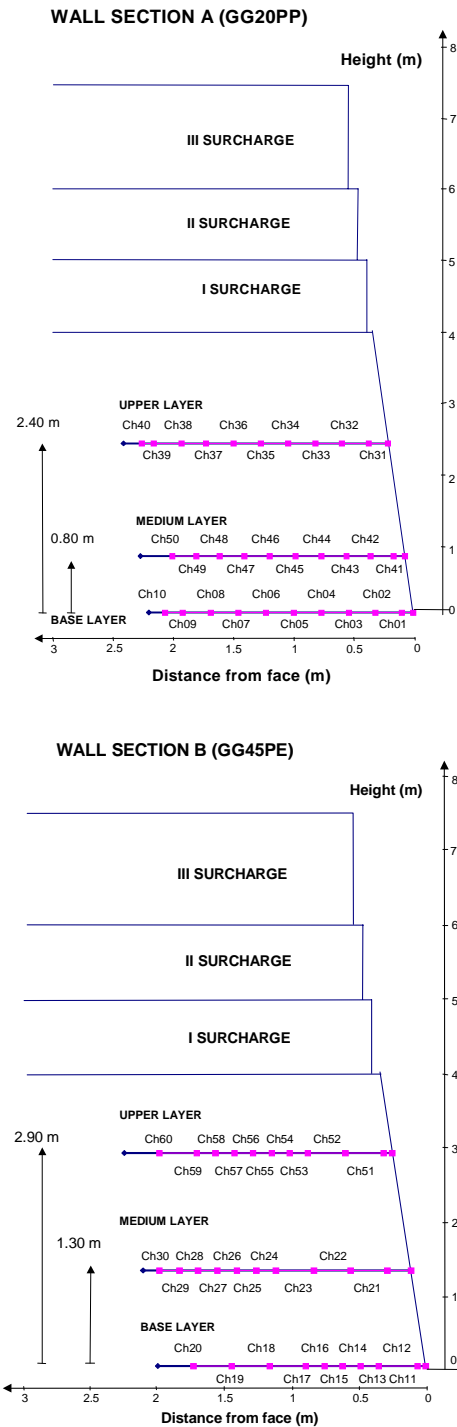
Cross sections of the two walls and strain gauges location along reinforcements.
